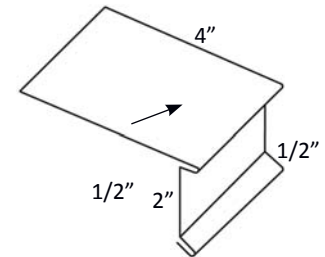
Eave Flashing with Under Eave Trim Dimensions
